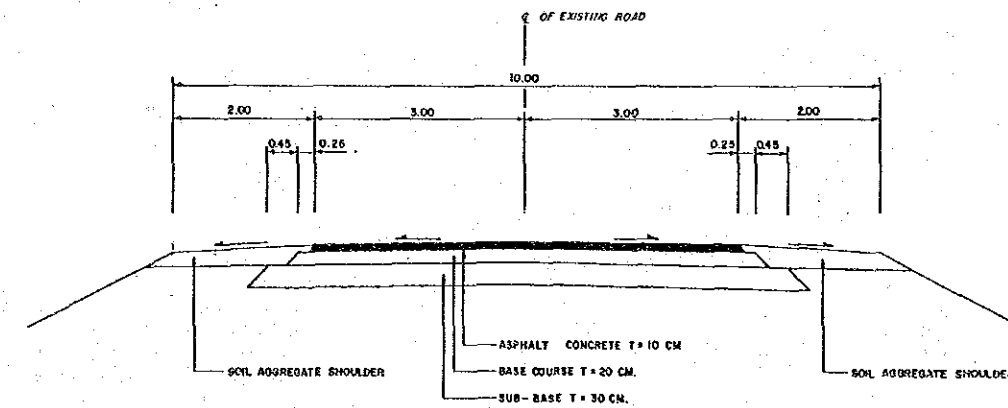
FIGURE TYPICAL PAVEMENT STRUCTURE FOR FLEXIBLE PAVEMENT IM-14
